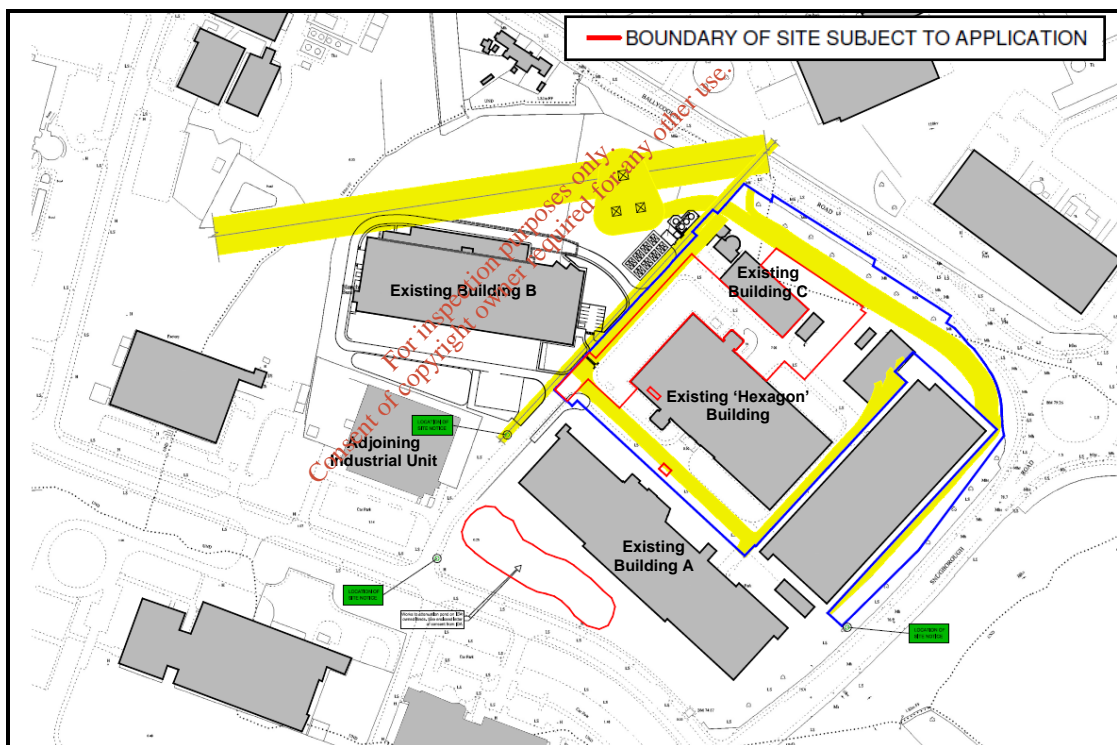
Site Location and Site Boundary (in red) (Source: MCA Architects, December 2017)
